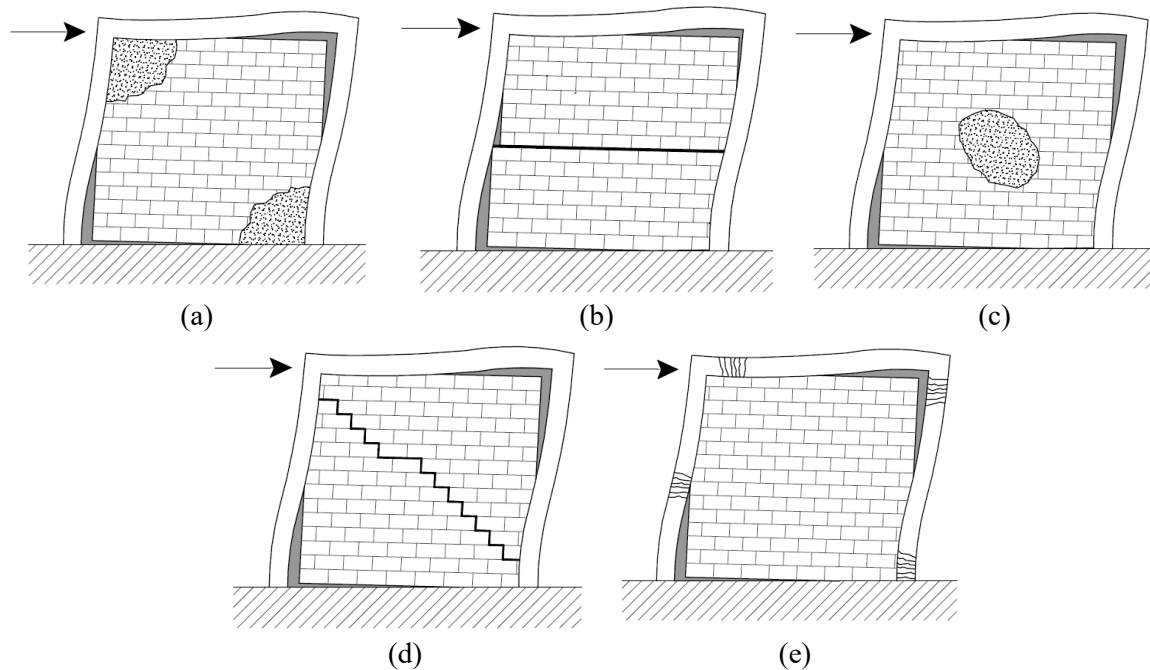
Different failure mode of masonry-infilled frames: a) corner crushing; b) shear sliding; c) diagonal compression; d) diagonal cracking; e) frame failure (taken from El-Dakhkhni et al., 2003)
